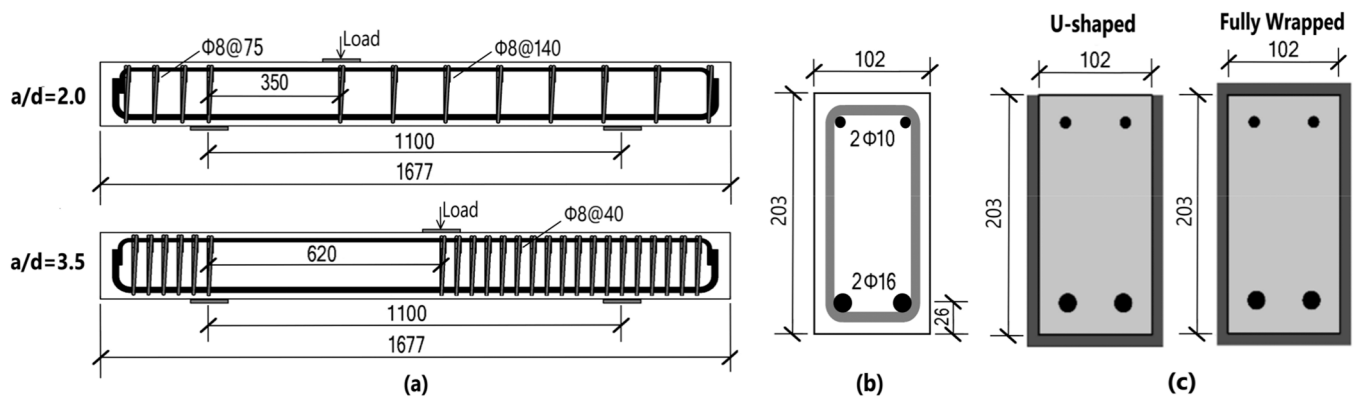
(a) Layout of the reinforcement; (b) Cross section; (c) Jacket configurations.
